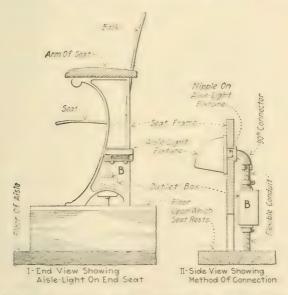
Showing method of wiring an aisle-light fixture, when aisle lights are provided after theatre has been finished. In a new building, the outlet box, B, may be installed flush with the floor.
